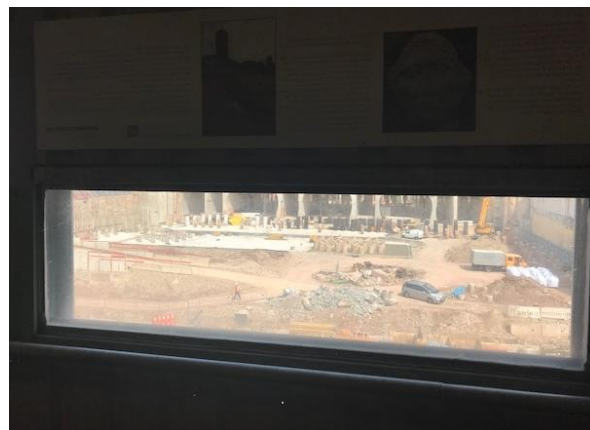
Stuttgart Hbf: Bridges connect the old station building with the temporal platforms, providing information and a direct view on the construction site (© Otsuka).
